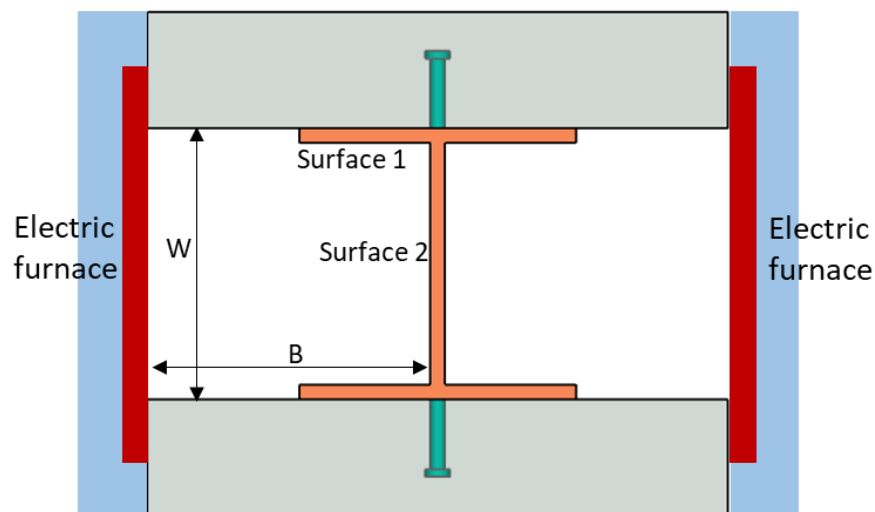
Cross-sectional view of the push-out test specimen with electric furnaces
